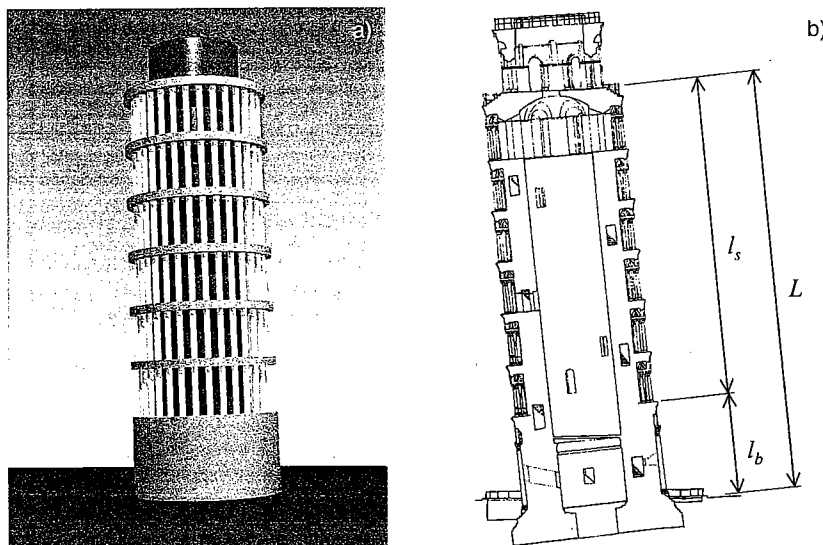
External geometric shape of the mechanical model of the Tower as an assemblage of series and parallel connected straight circular hollow cylinders (a), vertical cross section (b)
